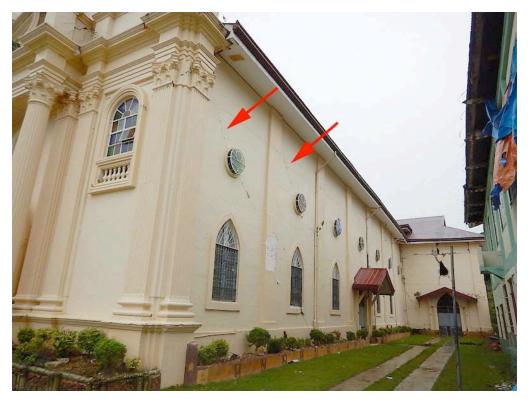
View of the southwest corner, and nave south side elevation and south transept, showing typical diagonal cracks at the arrows. See also fig. 28 for the interior view of the same cracks. The transept wall beyond is severely cracked, with horizontal cracks at a cold joint, and vertical cracks at the reentrant corner with the nave wall. The transept walls sustained more damage from the earthquake than the nave walls.
